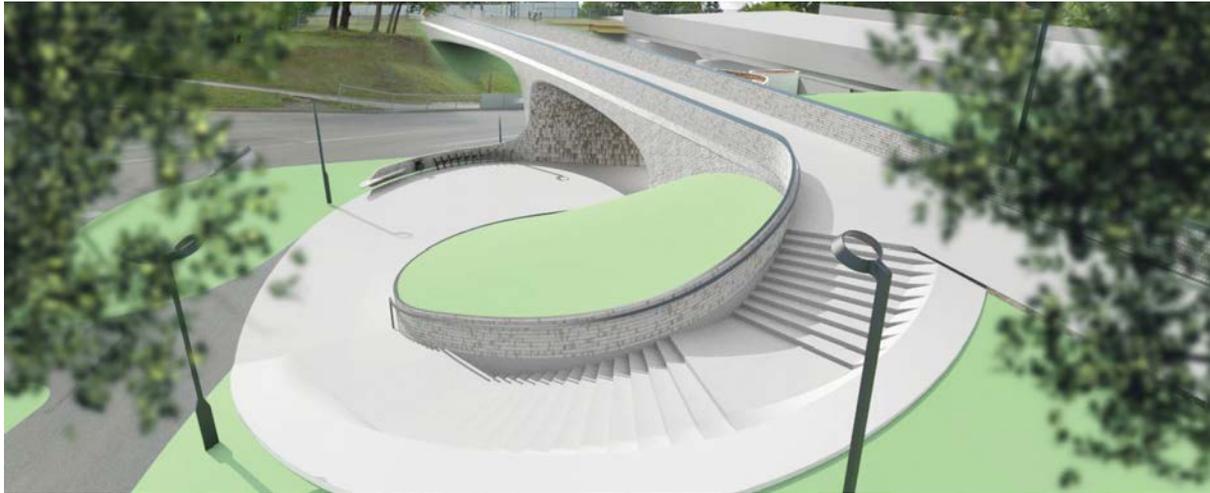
The winning design for the reconstructed railway tunnel at Riia Street. (Author: Part OÜ, Sille Pihlak, Siim Tuksam, 2017.)
